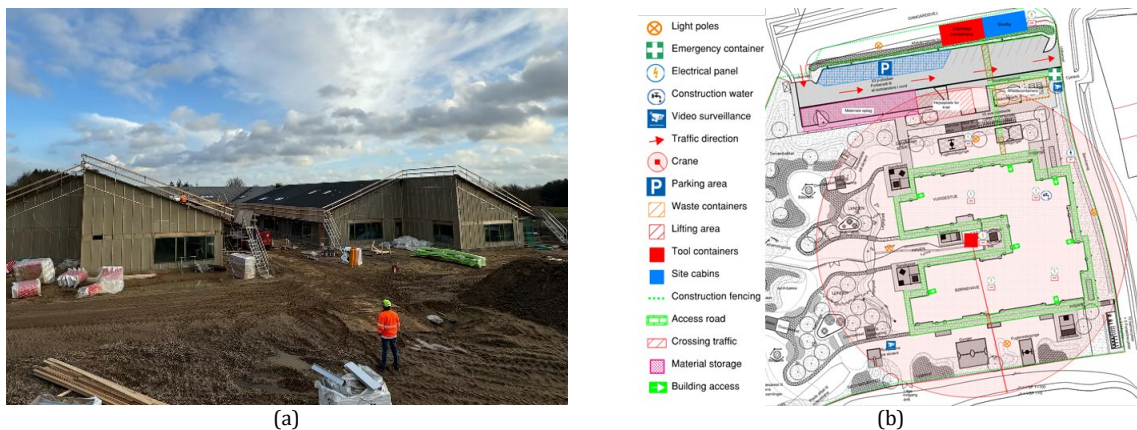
Case of the study: (a) Jobsite photo and (b) Site layout
